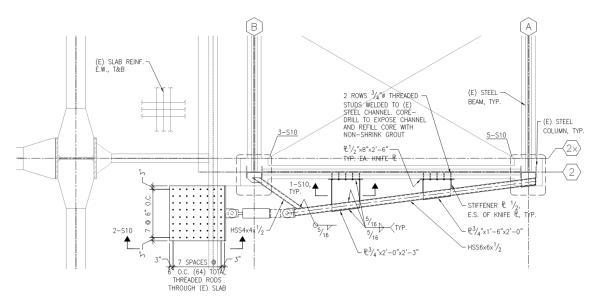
S2: Mechanical Tower Dampers retrofit partial plan. This detail is oriented identical to Figure 59, with the half of the mechanical tower shown at right and the laboratory building steel framing shown at left.
